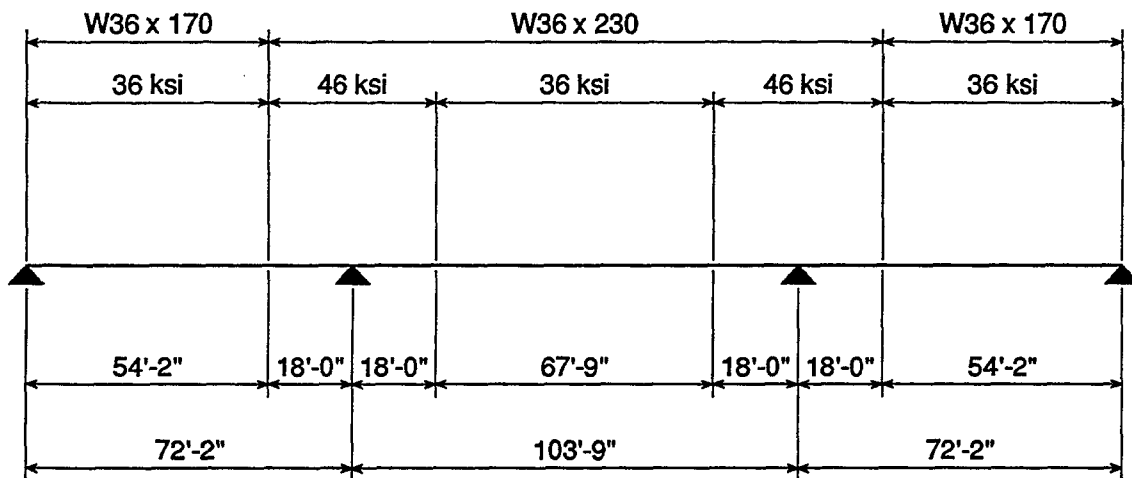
Girder Details for 3-Span Continuous Bridge at CBD Interchange
